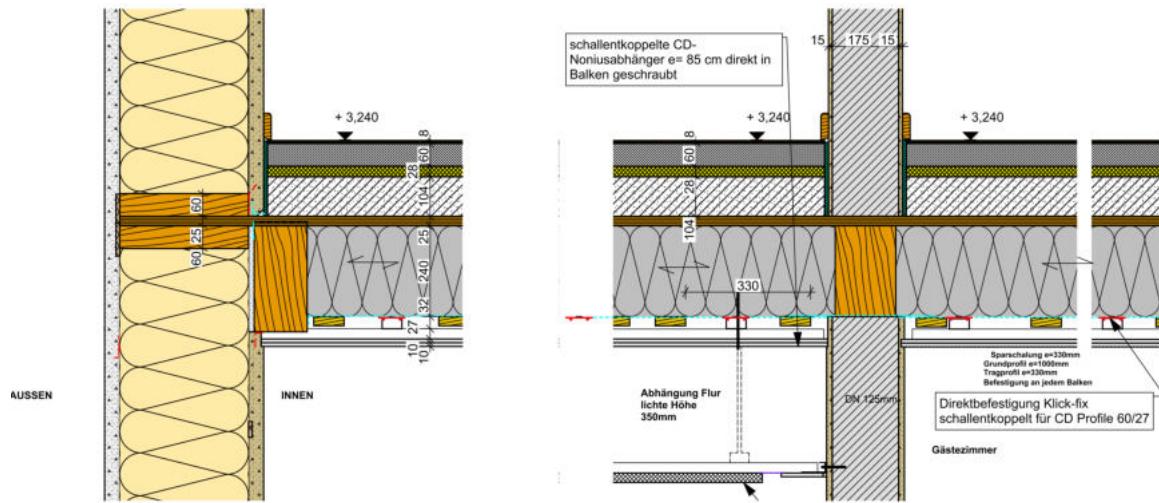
Component structure of the examined partition ceilings with connections to the inner and outer wall
